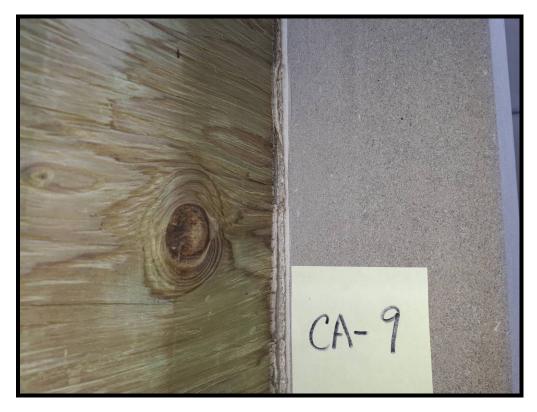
Sample # CA – 9 : Non-asbestos exterior window caulking (white) located on the Powerhouse.
